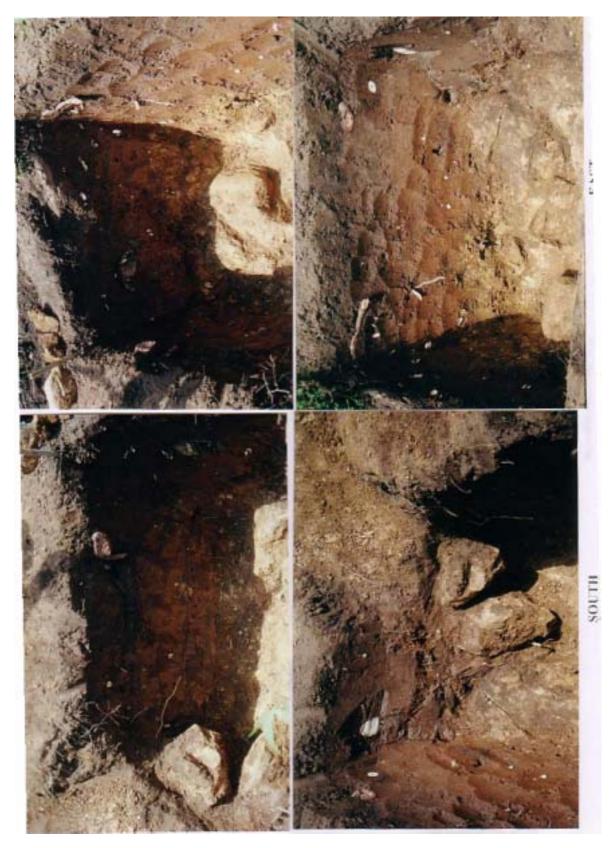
Photograph of Left Bank Test Pit No.2 (2/2)
